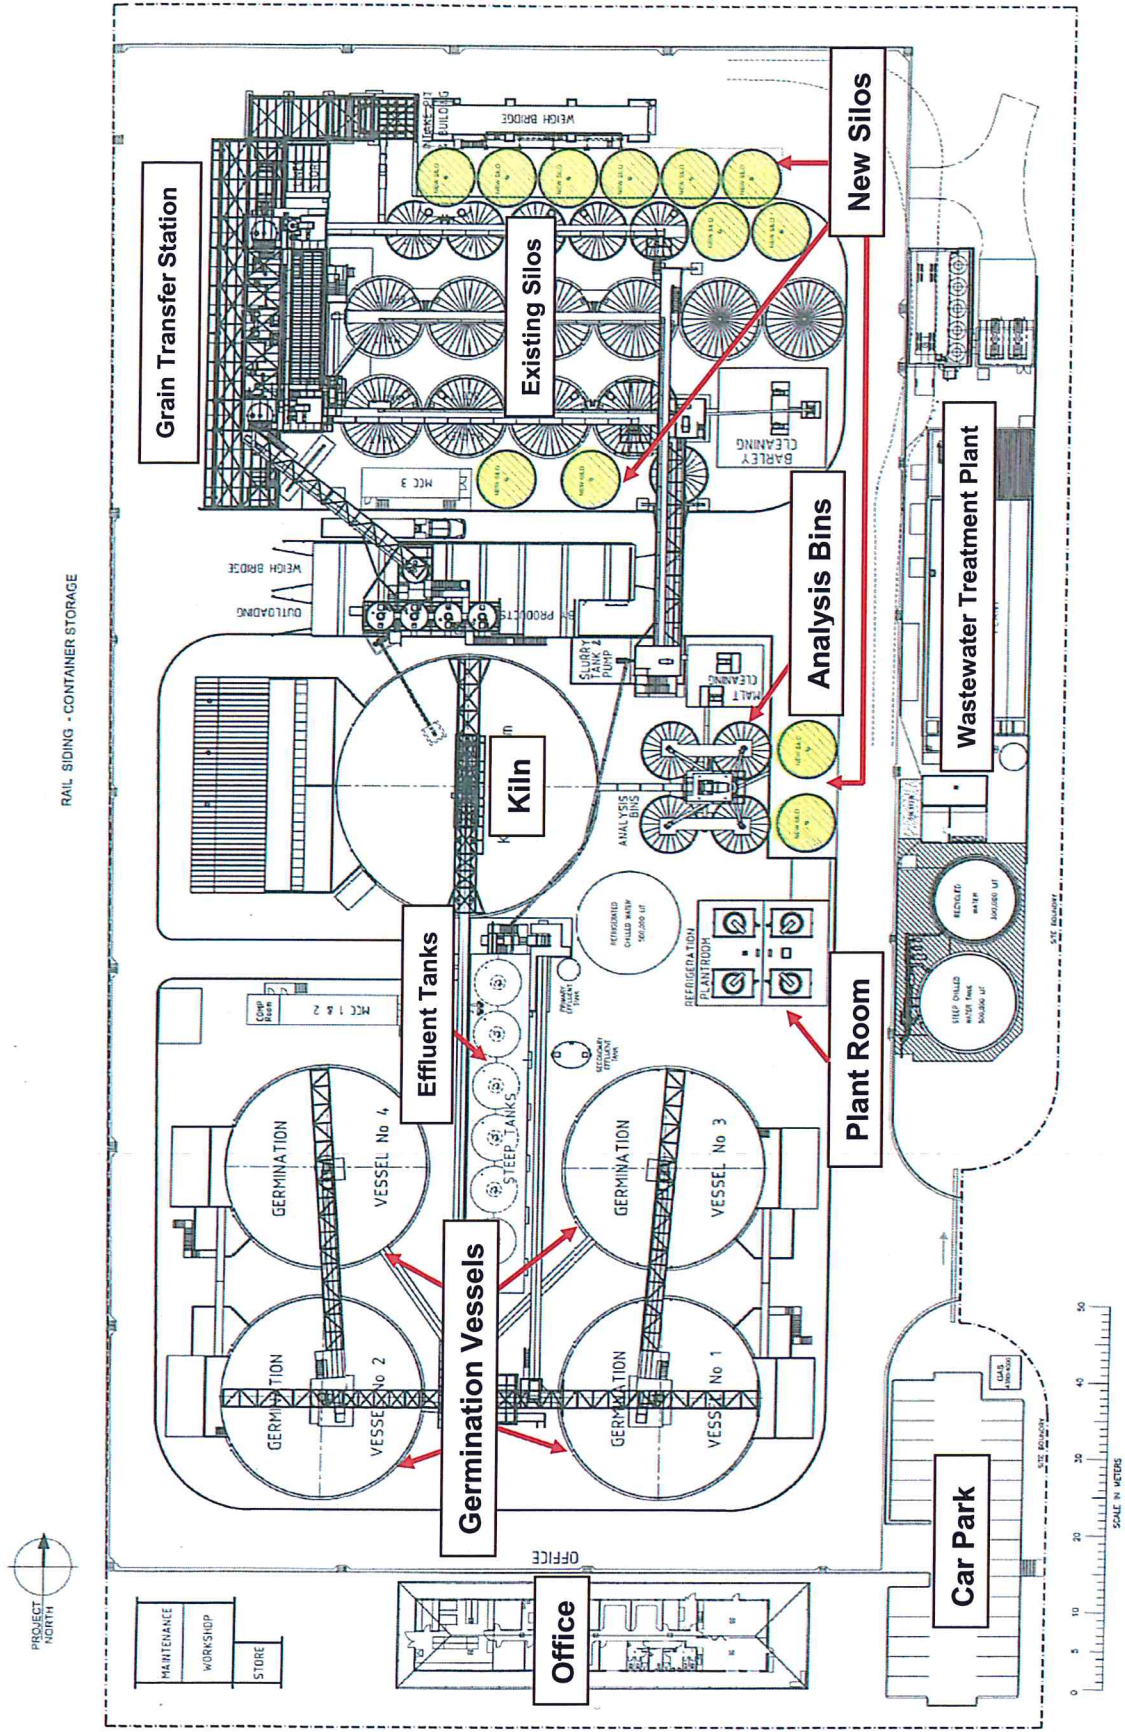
Existing site layout and proposed modification (see highlighted in yellow)
